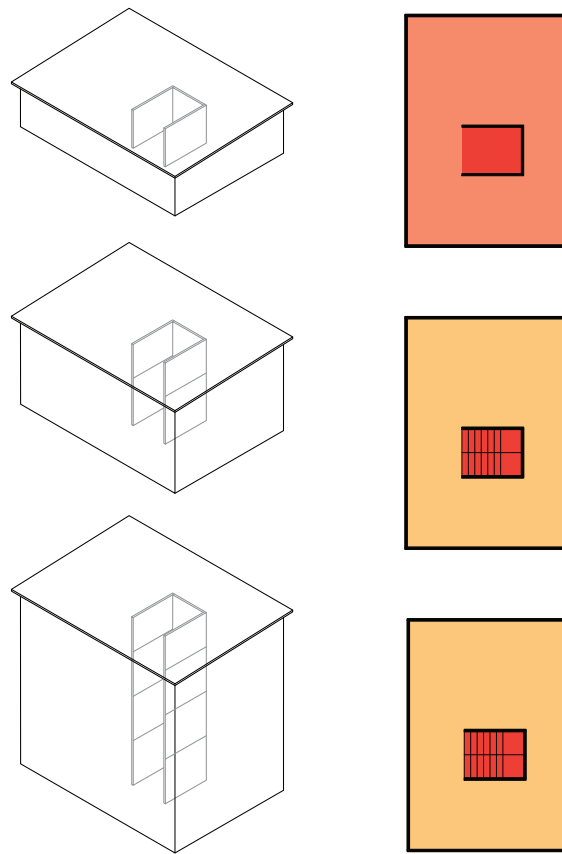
The staircase as a core to expand from vertically (plans not to scale)
